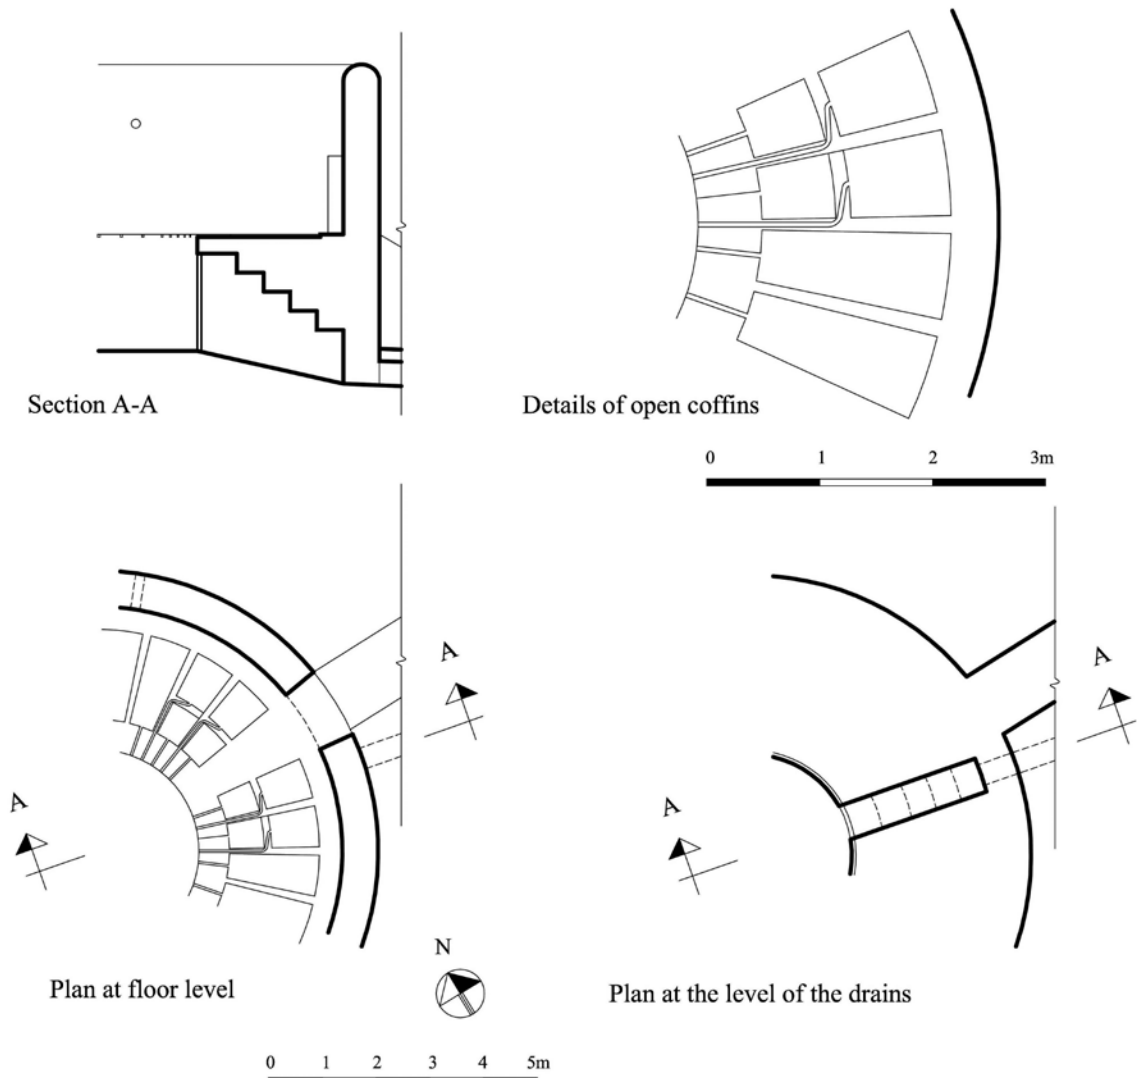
South Tower, detailed plans and section of the *pāvis* for children and adults, and one of the drainage ducts.
